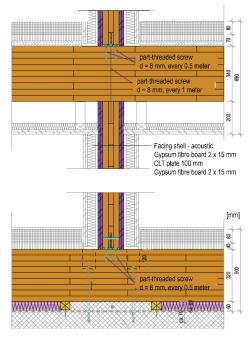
Details of the connection of the load-bearing wall to the ceiling, the wall fulfils R60 fire resistance, Source: Timbatec Holzbauingenieure Schweiz AG
